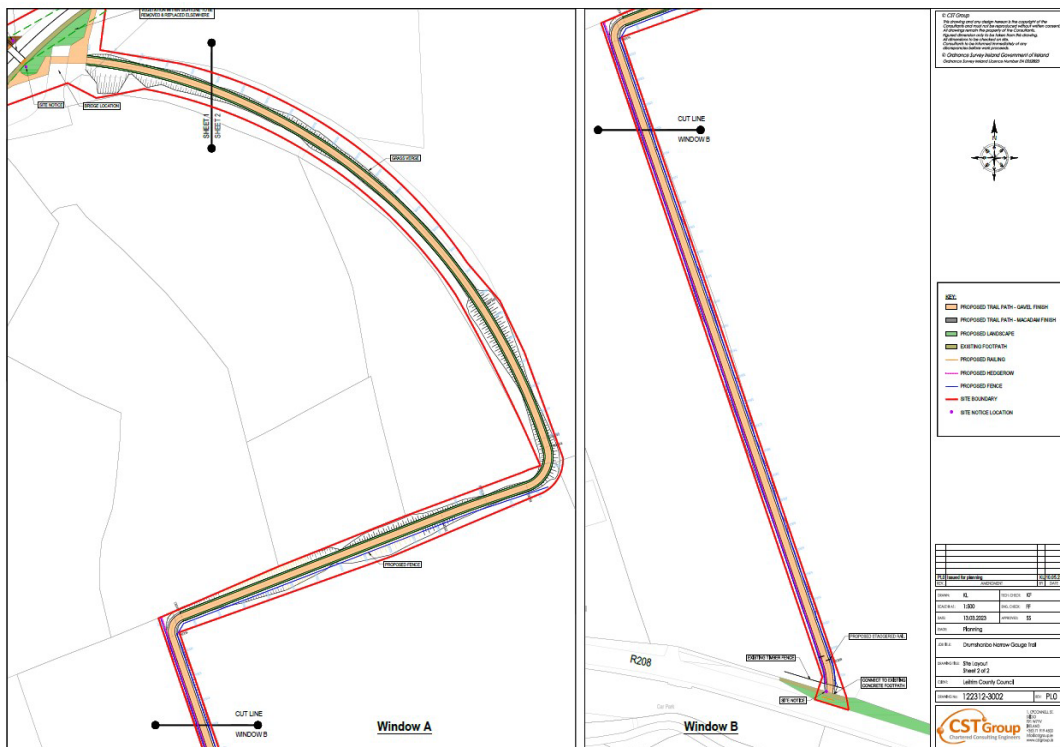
Detailed development plan of the mid-section and the southern end of the proposed trail.
